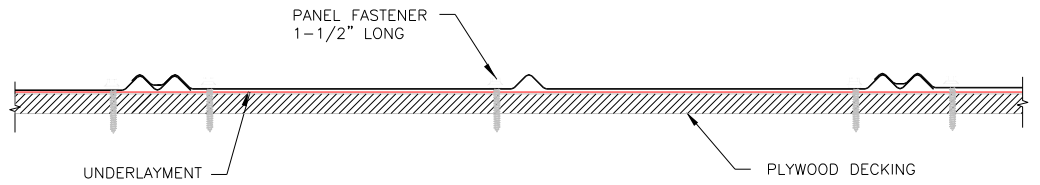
5V Panel Detail – Fastener Pattern 1 (Minimum 26 Gauge)
